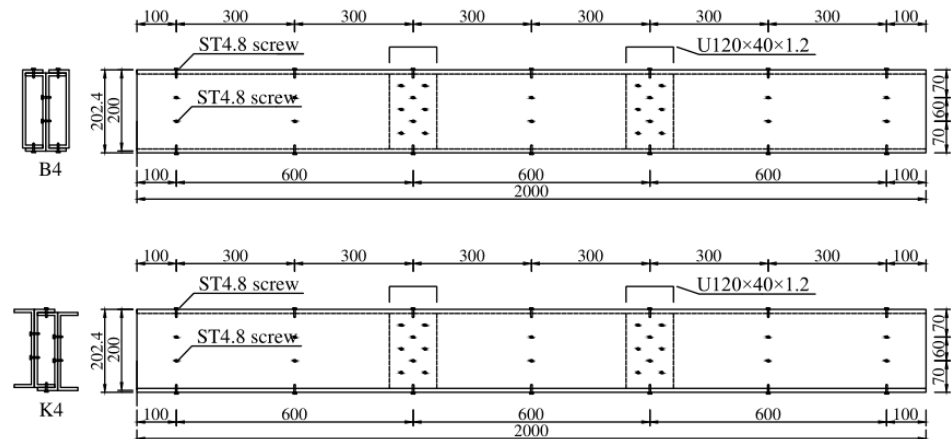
Dimensions of B4 and K4 beams (Unit: mm).
